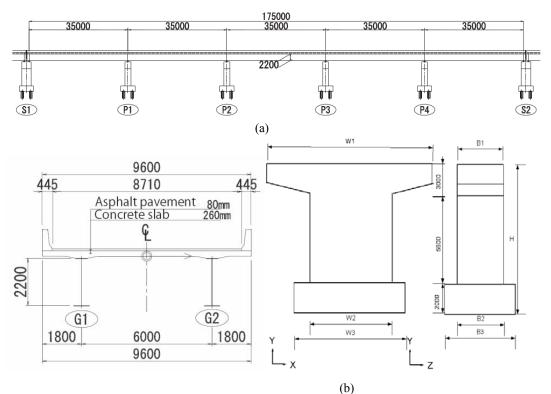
Physical model of a six-span continuous seismically isolated highway bridge (a) longitudinal sectional elevation of the bridge, and (b) transverse sectional elevation of the bridge; all dimensions are in [mm]
